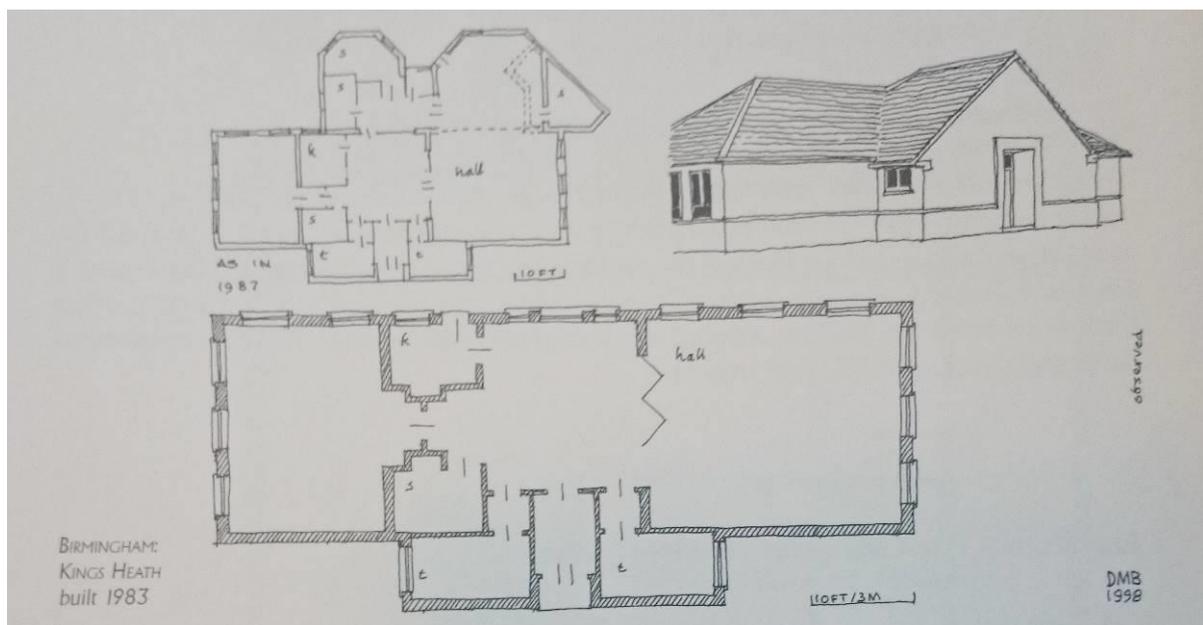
Ground floor plan of the meeting house as reconstructed by Butler (north to the right; not to scale) (Butler (1999), vol. 2, p.628)
